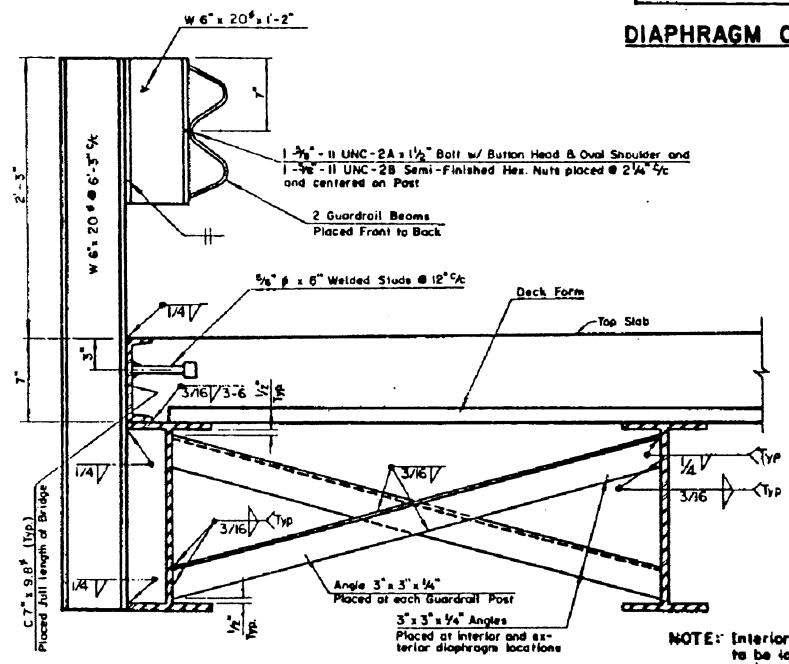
Ohio Standard Superstructure Details for Steel Beam and Girder Bridges, 1969
